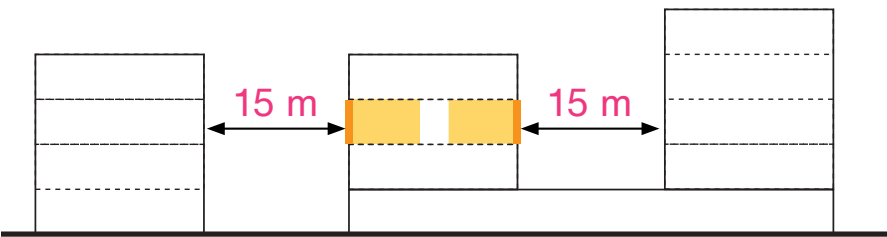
Minimum 15m setback between blank walls and habitable rooms
